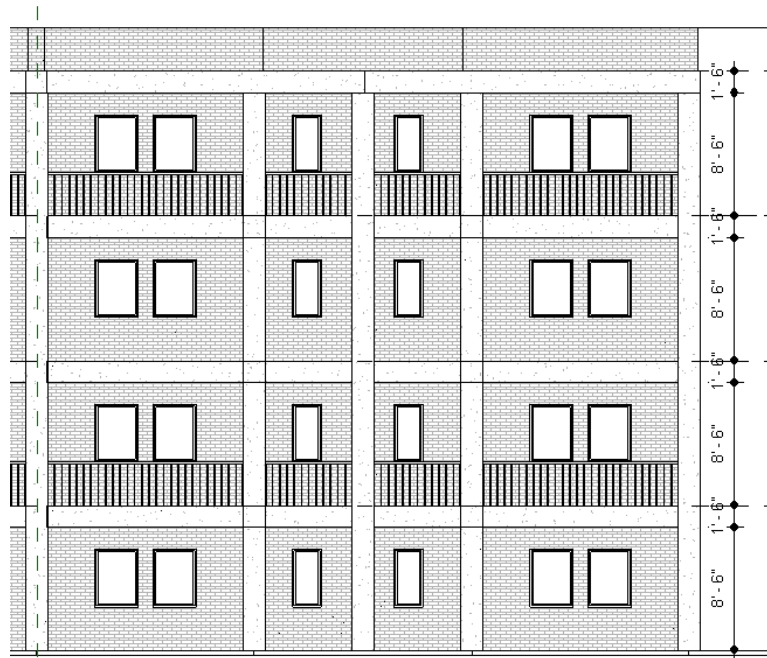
Sketch elevation for adding structural elements to the Apartment 2 project
